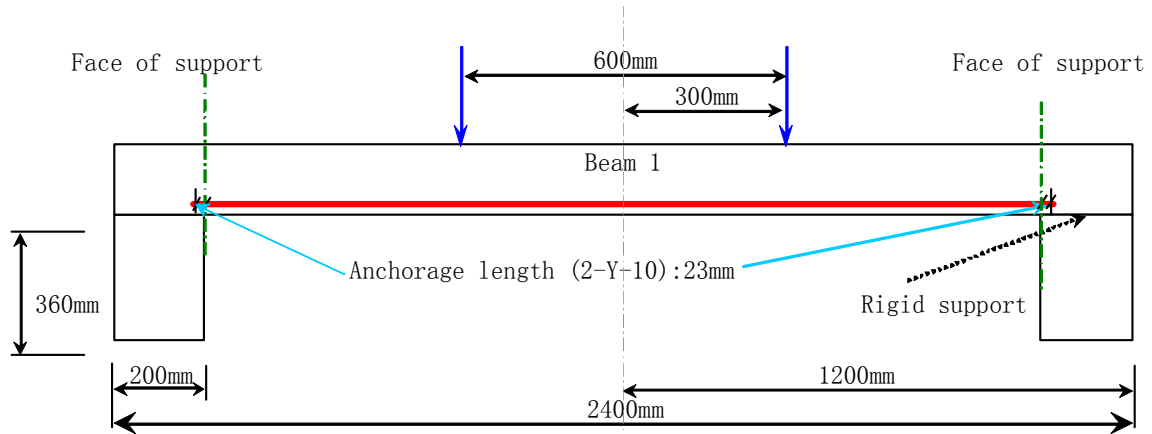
Sketch for end anchorage length of tension reinforcement and support conditions for beam 1.
